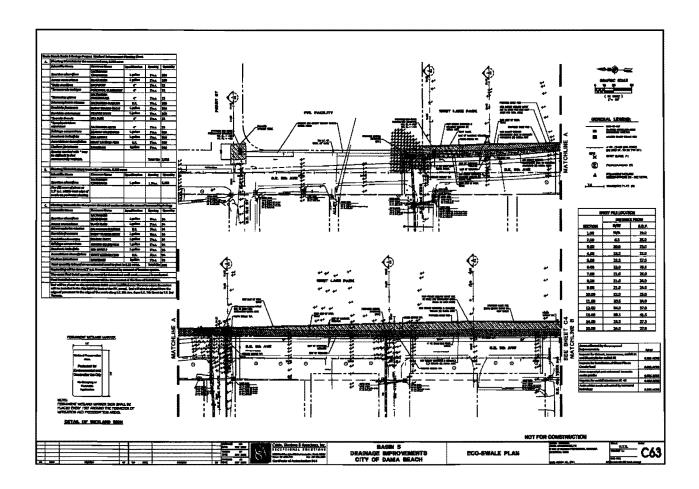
EXHIBIT "C" DESIGN PLANS FOR STORMWATER RETENTION SWALE (continued)
